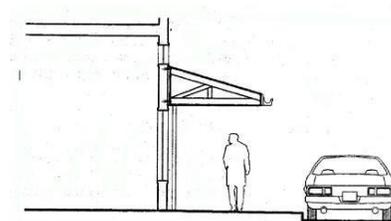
A nono-truss canopy attaching its vertical chord to the structural frame
